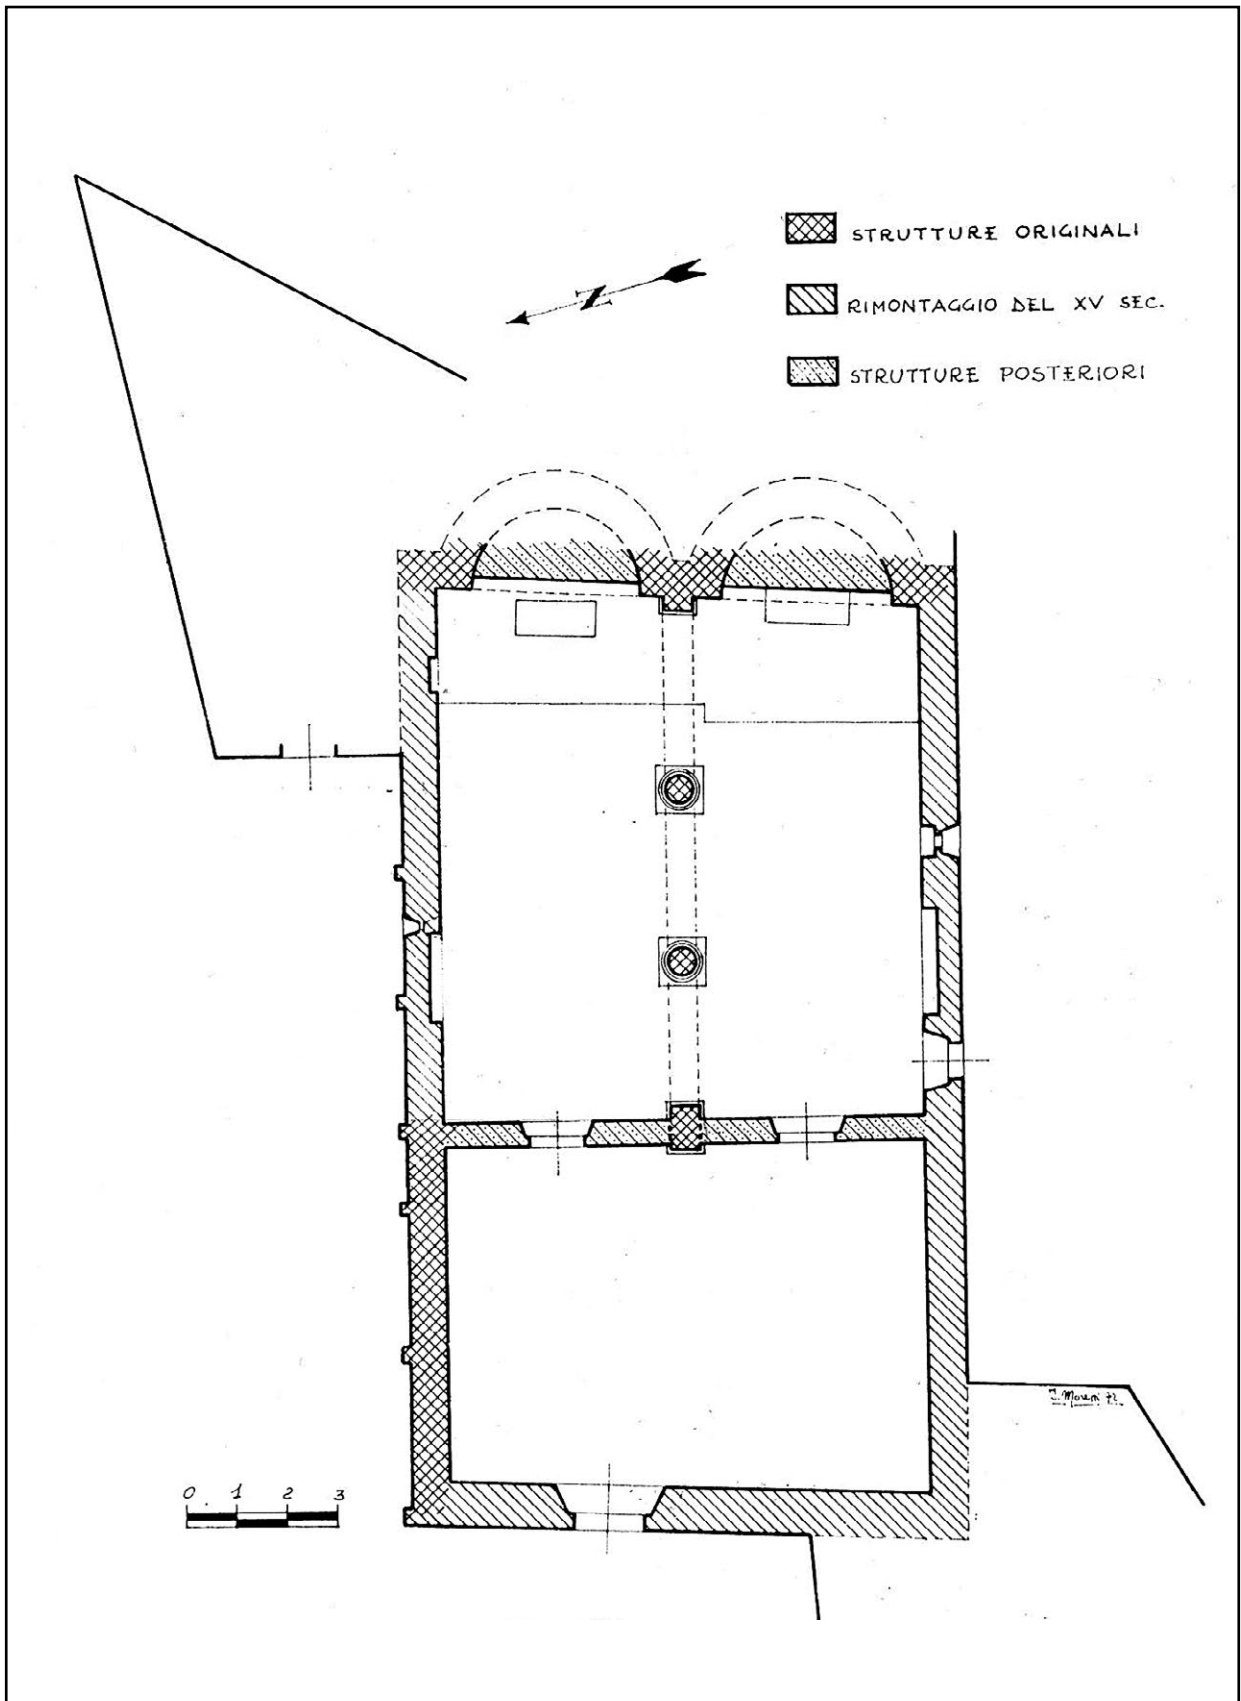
Island of Elba. Plan of church of S. Pietro in S. Piero in Campo (from Moretti, Stopani 1972, 43)
